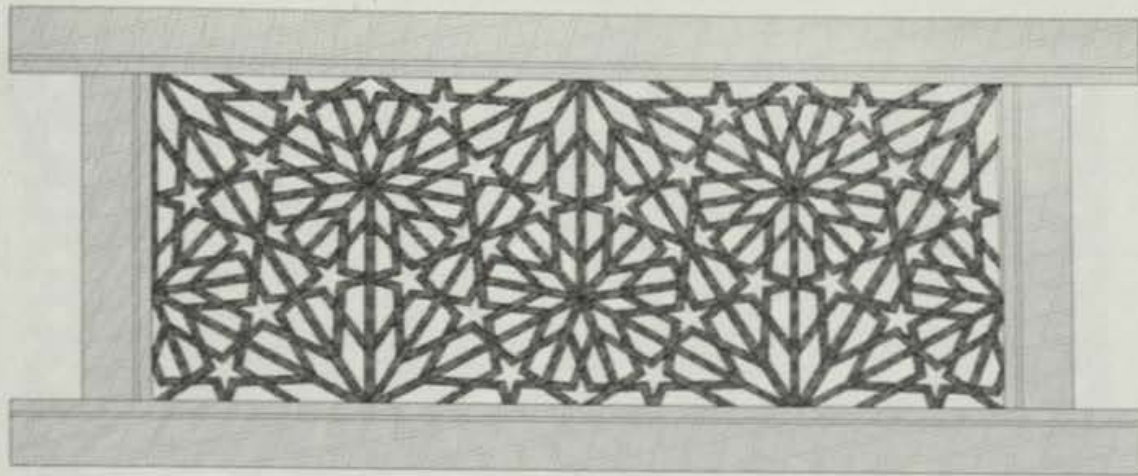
Drawing of wooden screen in nine corner star geometrical pattern.
